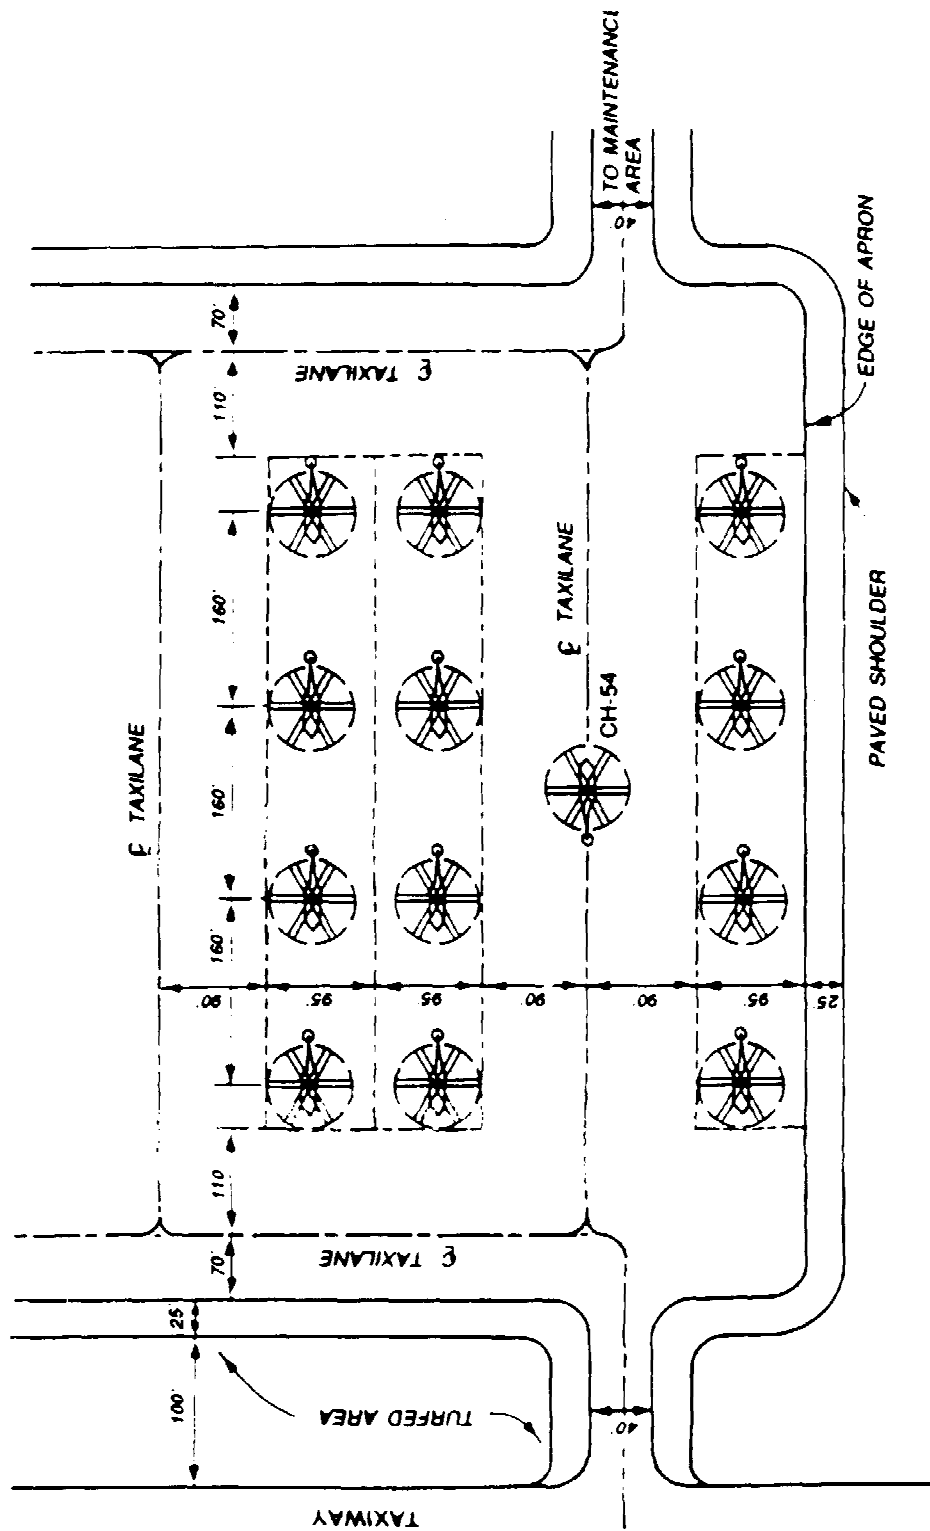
CH-54 Parking Plan, Type 2 (Double Parallel)
